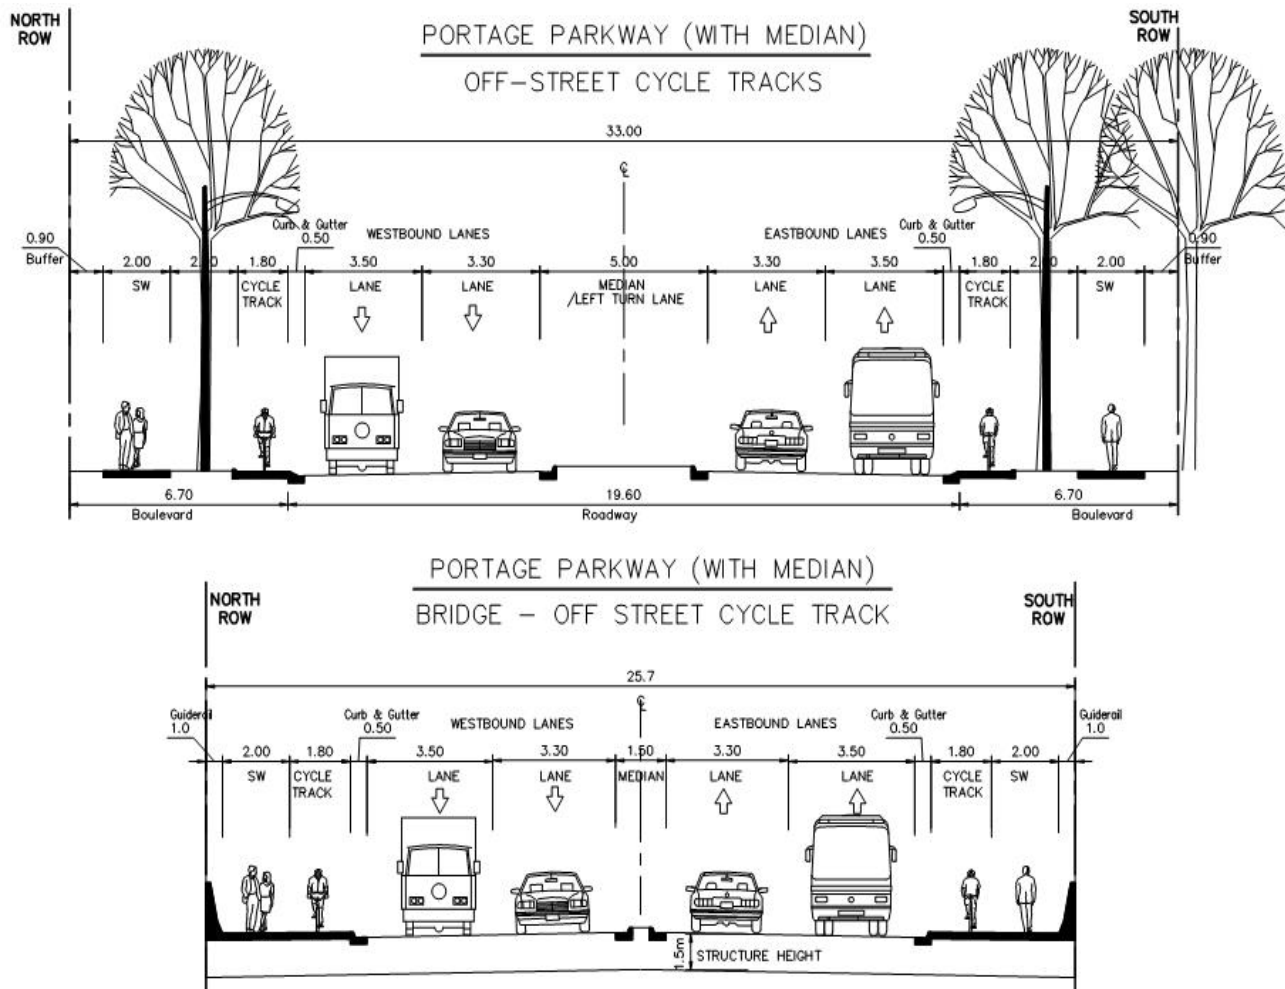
Portage Parkway Preferred Design Typical Cross-Sections
